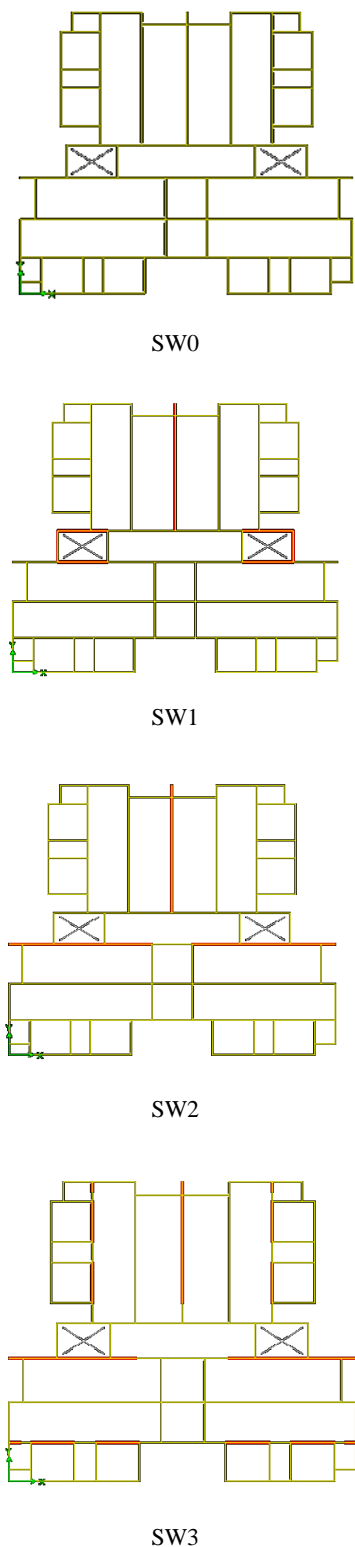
Structure plan without shear wall shown with “SW0”, and shear wall distribution pattern 1 to 3 illustrated by “SW1” to “SW3” respectively
